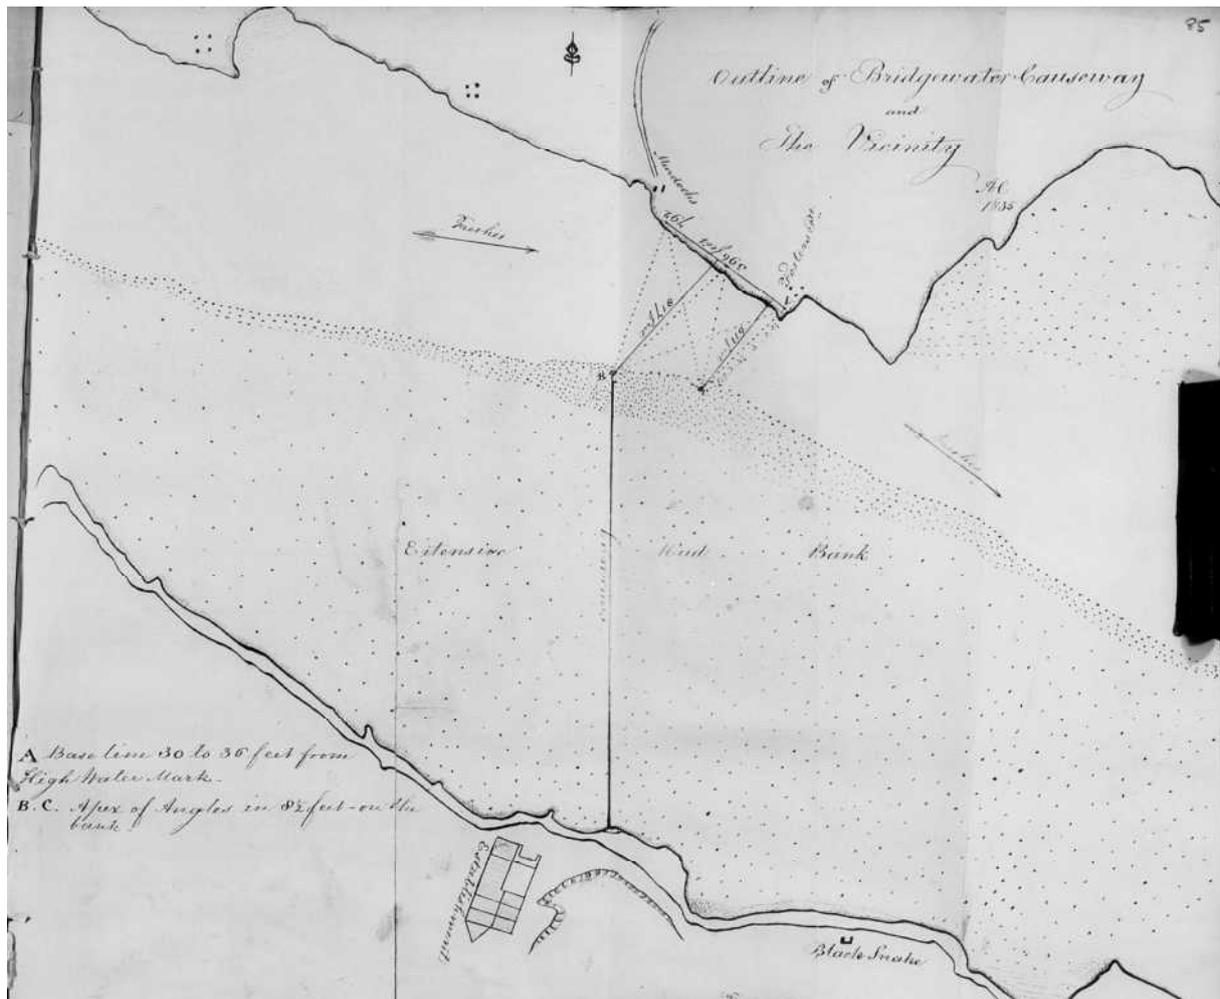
1834 plan showing the causeway and points of connection with the northern shore of the Derwent
